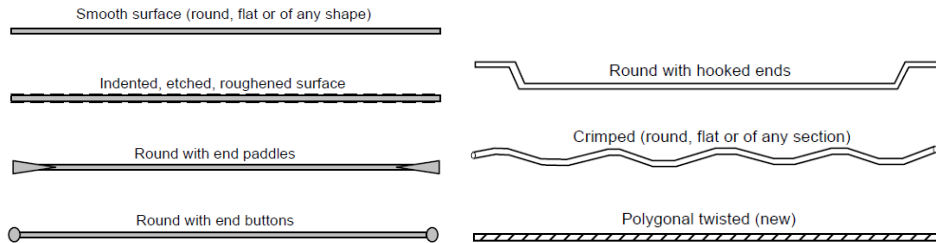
Typical profiles of steel fibres used in concrete according to Naaman (Naaman, 2003)
